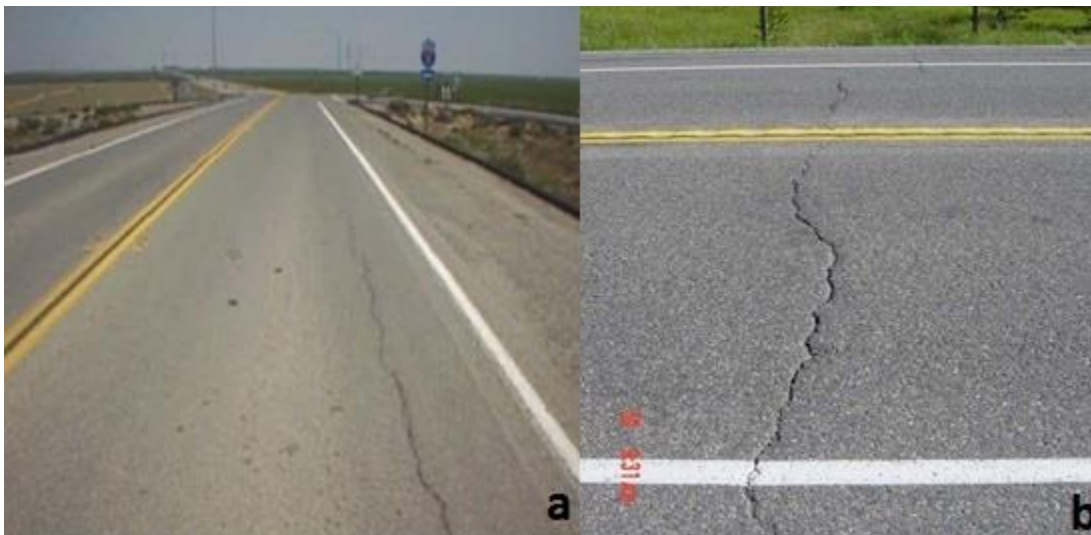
(a) Longitudinal cracking along the direction of the pavement centerline.¹⁰ (b) Transverse cracking perpendicular to the pavement centerline.¹⁰
